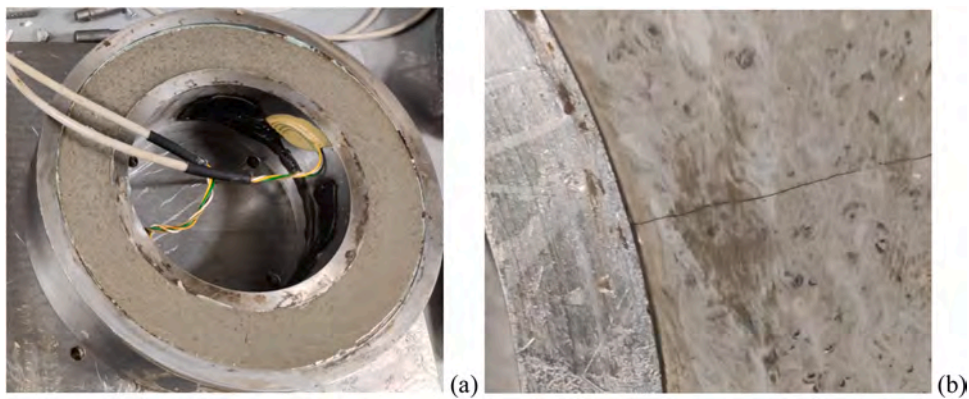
Retrain ring test, a- before cracking, and b- after cracking.
